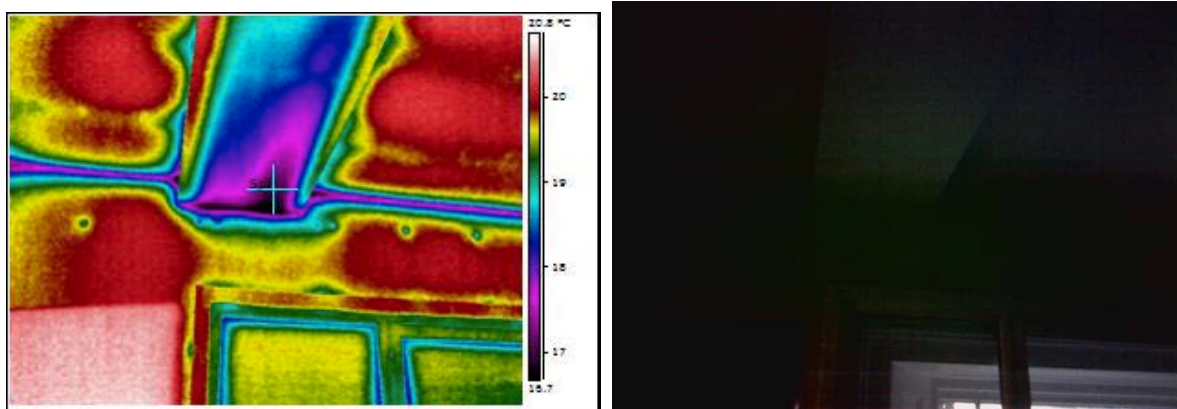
Room F21. The image shows heat loss through the structural beam in the ceiling of first floor.
